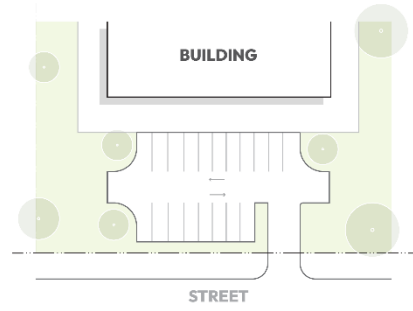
Permitted Parking Area Location - Between Building and any Street ROW
